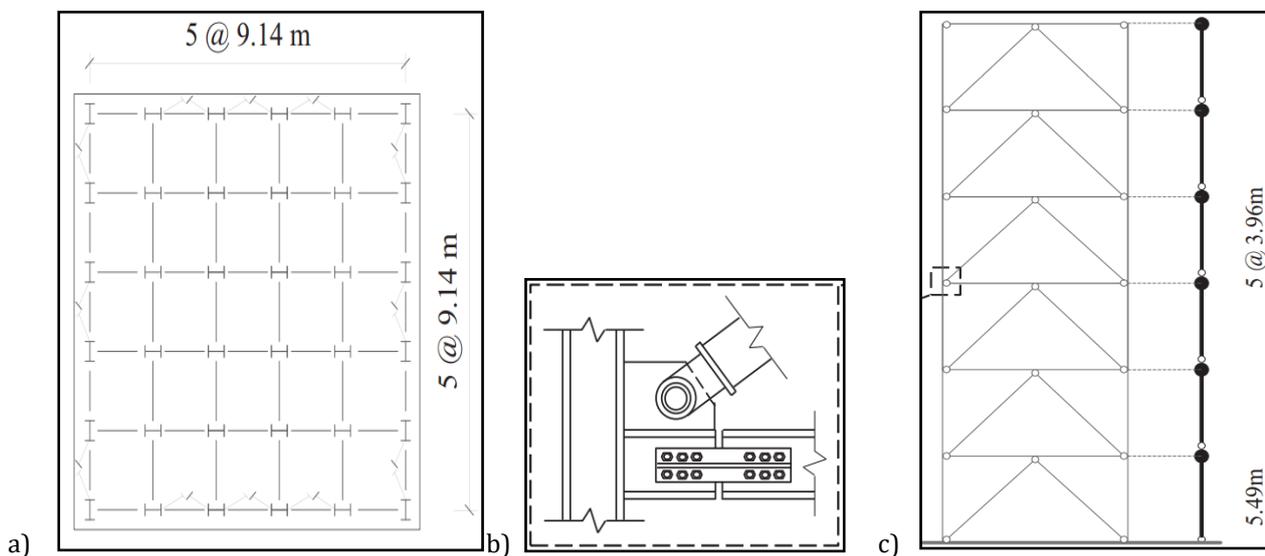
6-story frame building with SMAB: (a) plan layout; (b) beam-bracing-column connections;
